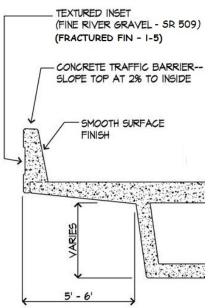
Textured Inset Location for Barriers on Bridges and Retaining Walls.
